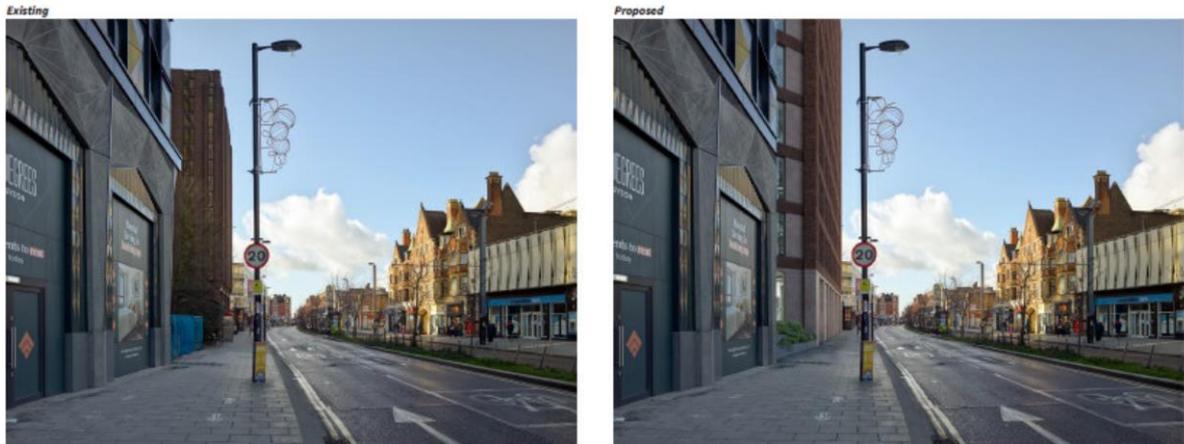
View No. 2 - George Street looking west: Existing and Proposed
